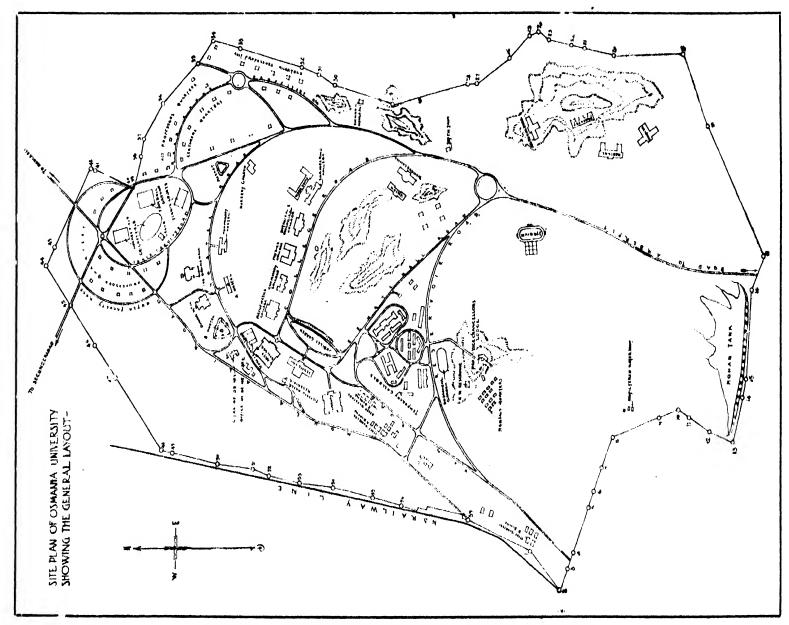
PLATE III - Plan showing Location of Buildings and Lay- out of Roads.
